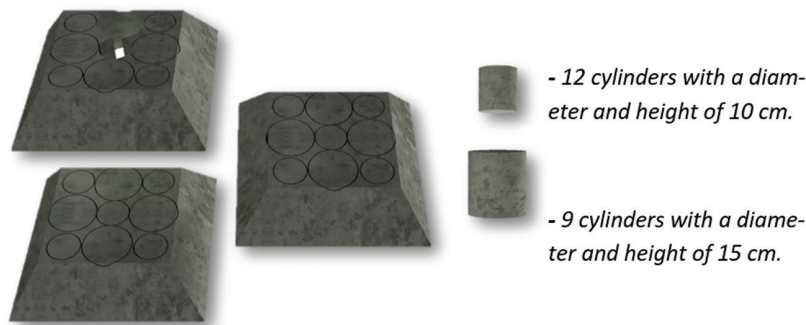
Arrangement used for the extraction of cores from shotcrete panels.
